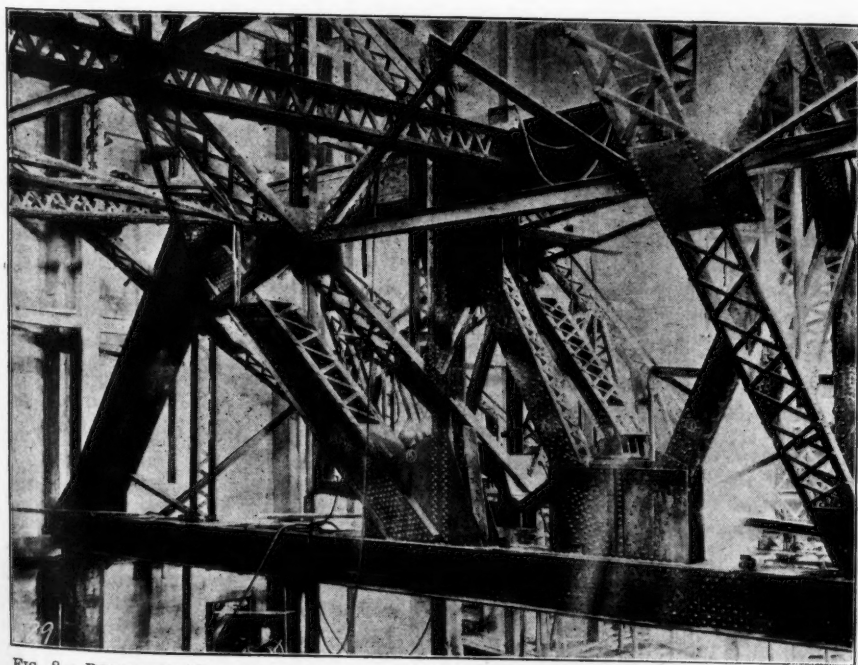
DETAIL OF MAIN BALCONY TRUSS, T-2, SHOWING PIN CONNECTION TO JACK TRUSS, T-1, AL MALAIKAH TEMPLE.
